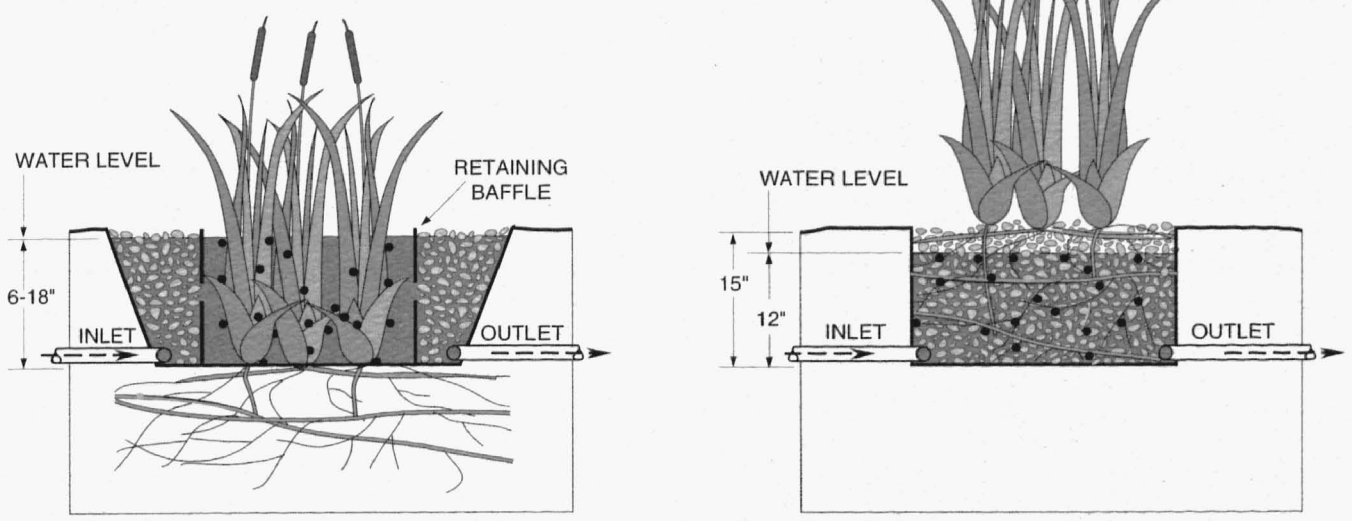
Types of constructed wetlands used for wastewater treatment. (Left) Free Water Surface (FWS). Rock surrounding inlet and outlet pipes protects pipe and helps distribute water. Retaining baffles (i.e. treated 2 x 6s) keep rock in place. (Right) Submerged Flow (SF). Black dots represent attached bacteria.
